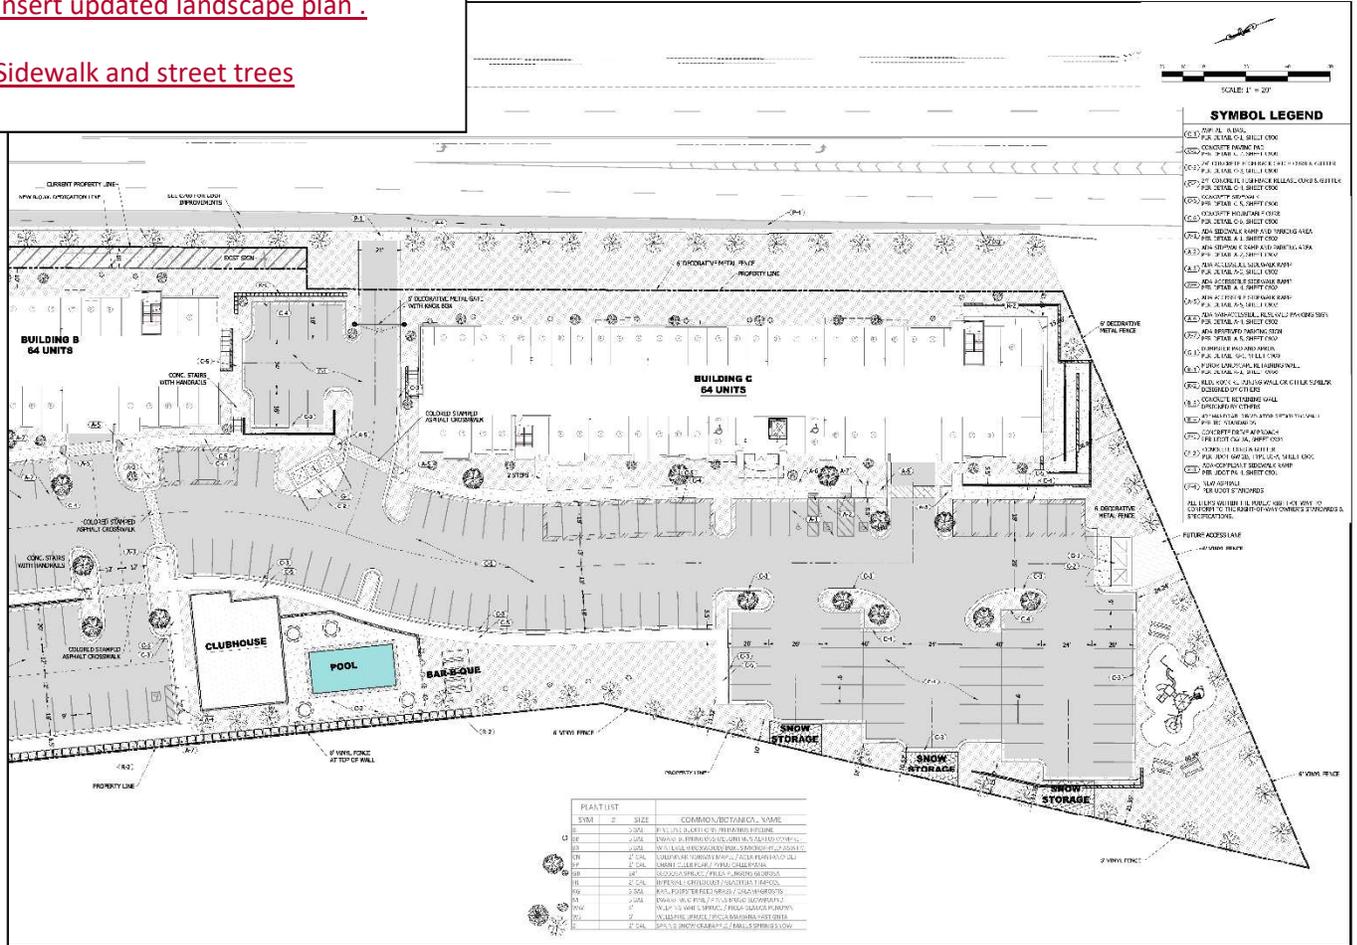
EXHIBIT "C" LANDSCAPE PLAN (1 of 2)
